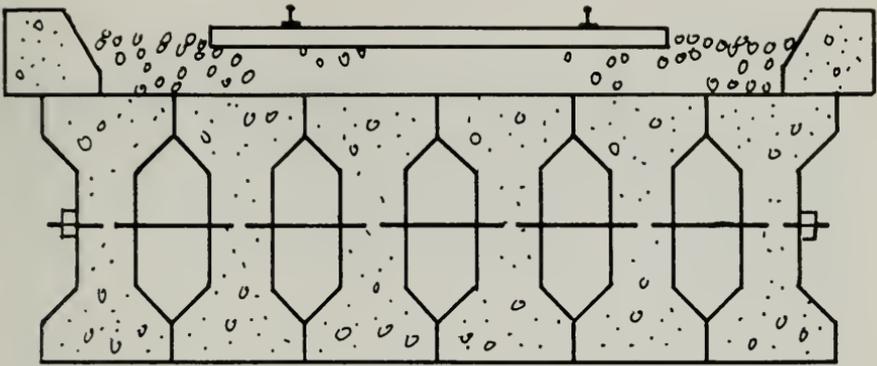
Sectional view through Santa Fe bridge showing typical details of girders, diaphragms and cast-in-place deck.
